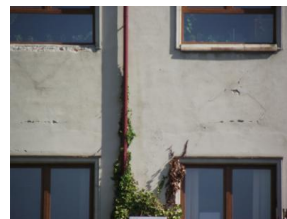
Western facade damaged outside load-bearing brick wall
